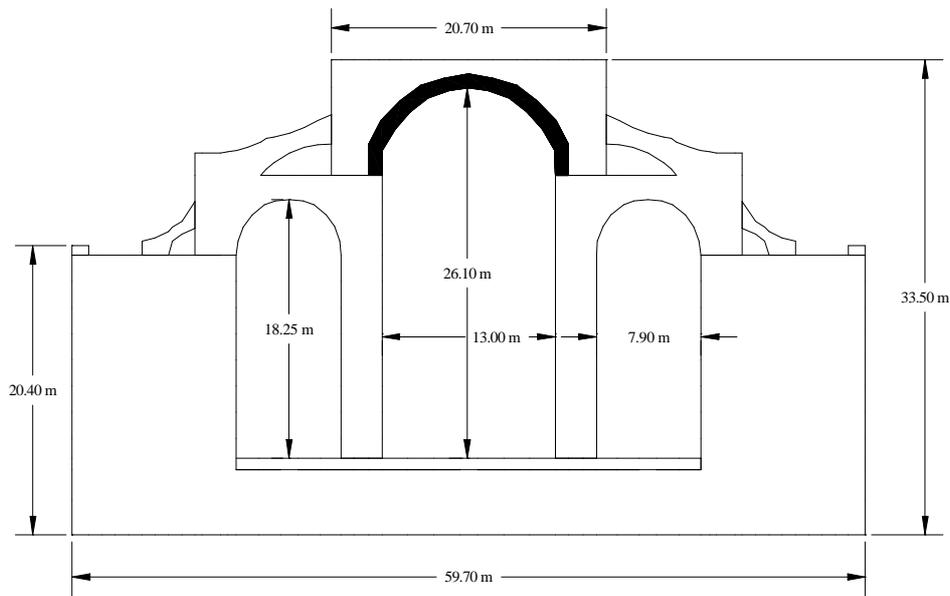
Typical transversal section of the Metropolitan Cathedral of Mexico City.
